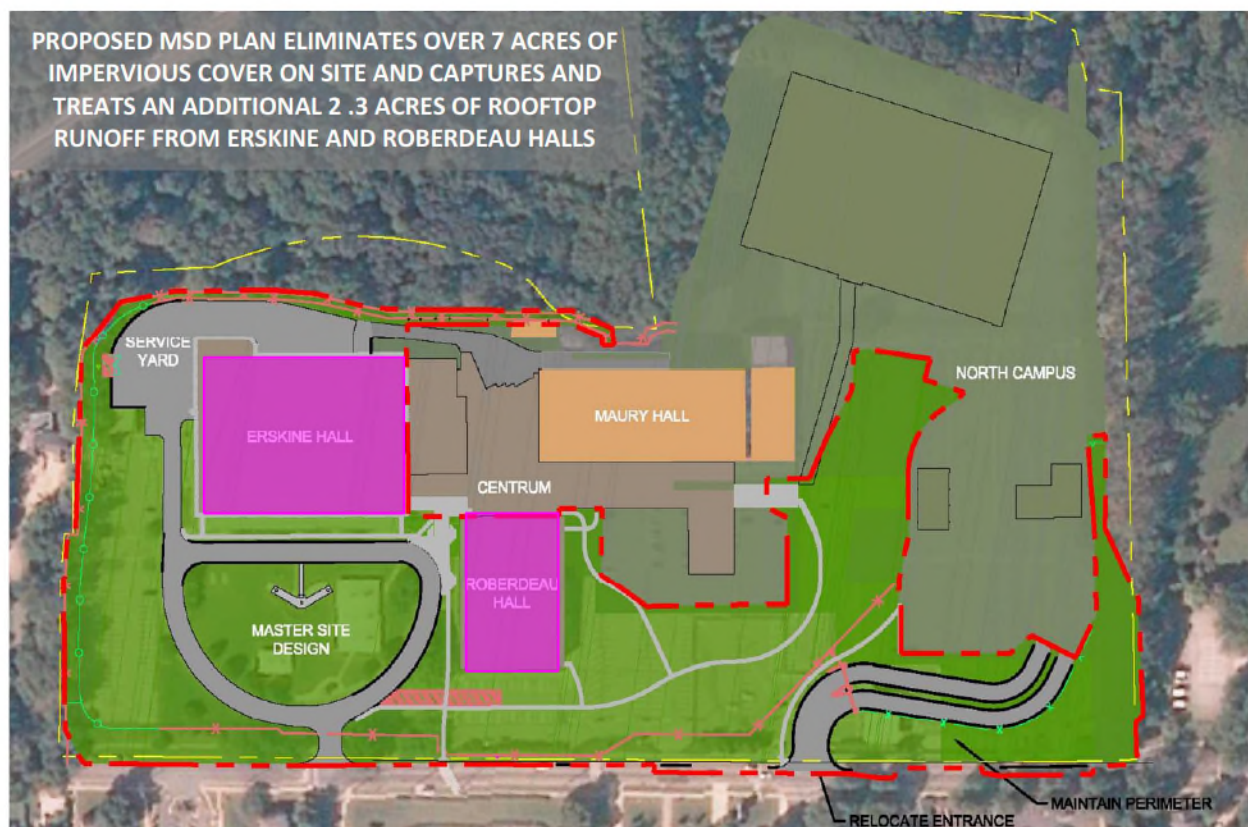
Stormwater Drainage Planning Area - Master Site Design Project
